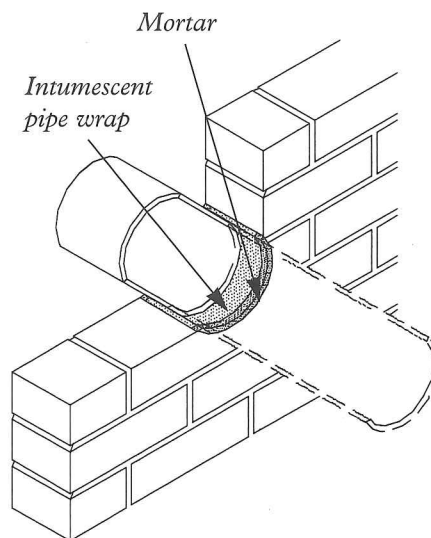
Intumescent pipe wrap fitted around a PVC pipe and within the wall
